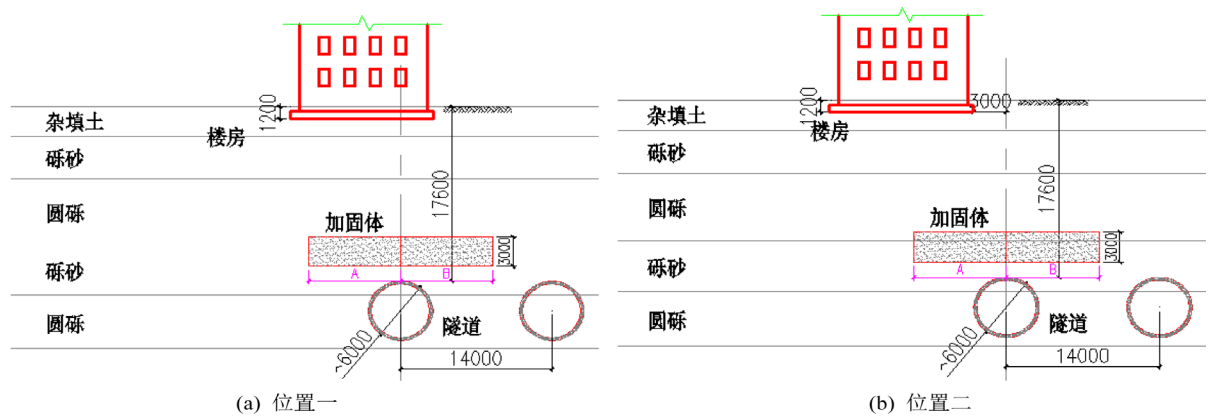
Width of Grouting Reinforcement Area above Tunnel (unit: mm)
